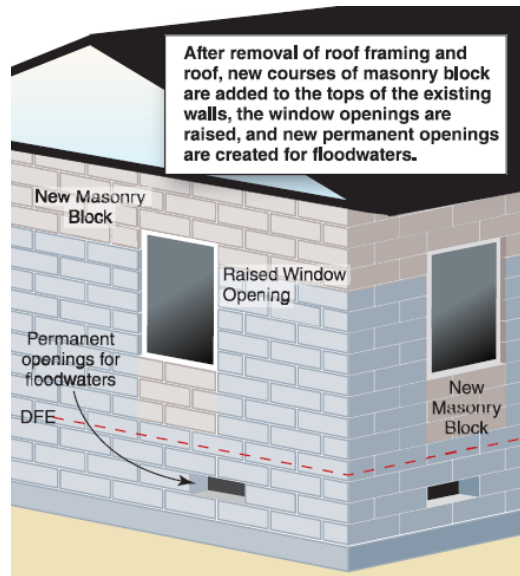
Once the roof is removed, additional masonry is added to raise walls and window openings are raised (FEMA)
